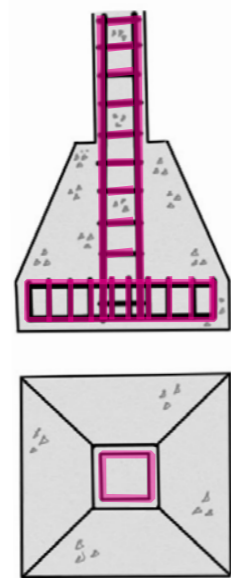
Stepped footing with reinforced concrete column with minimum 4 steel bars.
